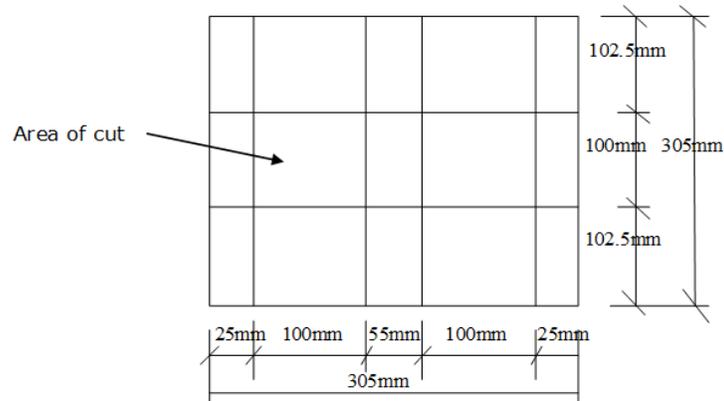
Plan of cuts for the 305 mm × 305 mm slab.
